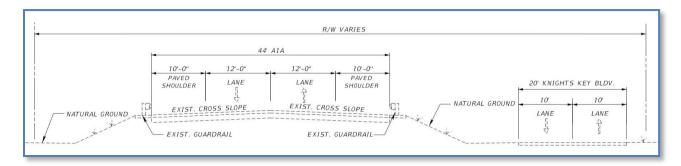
Typical Section: Roadway Approach at Bridge East End
